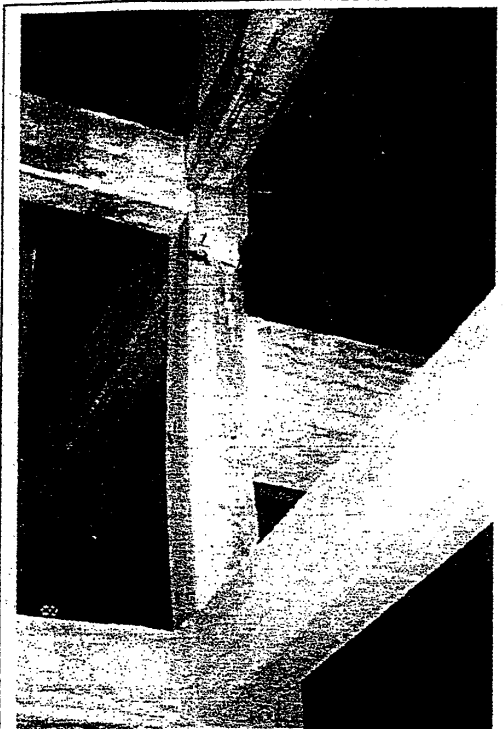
Shear and flexure failure of column; note top of column just under tie beam.
